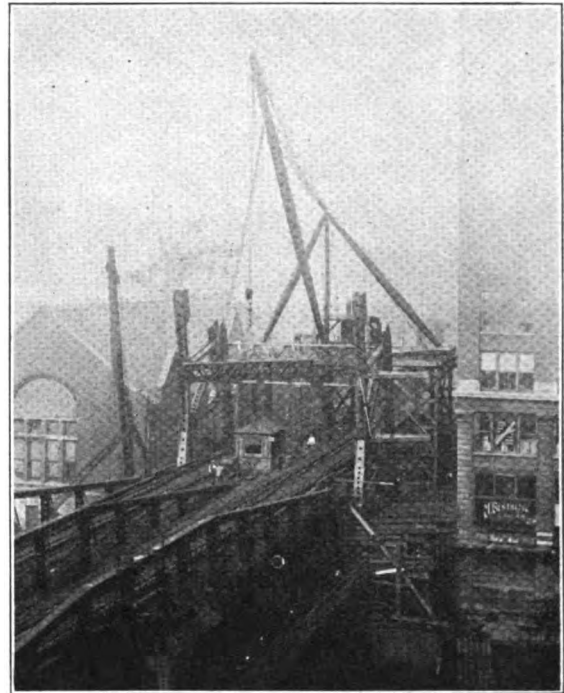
Derrick Mounted on Platform Above Elevated Railway Used to Handle Structural Steel Entering Into Bridge Construction.
